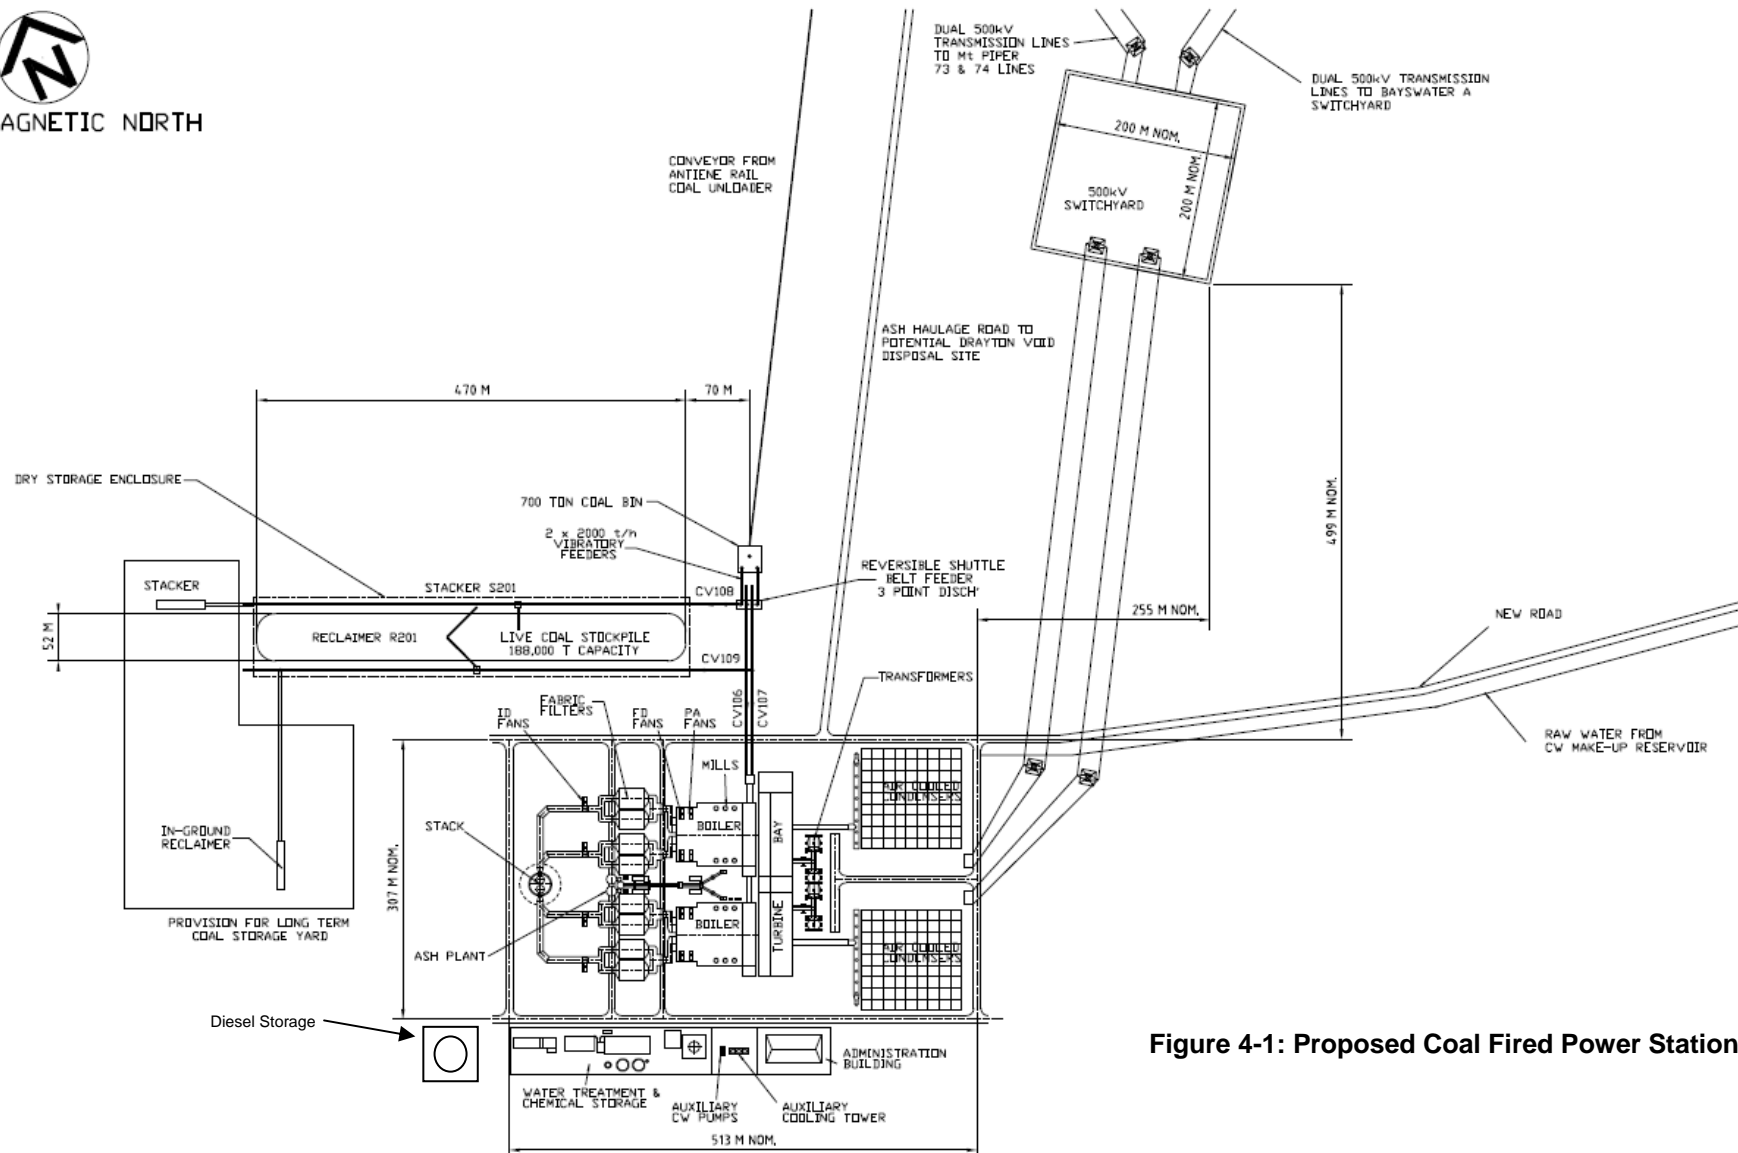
Proposed Coal Fired Power Station Site Layout
